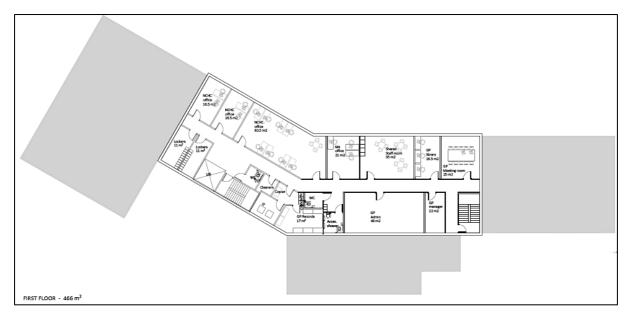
Rackheath proposed Hub - Preferred Option First Floor Plan
